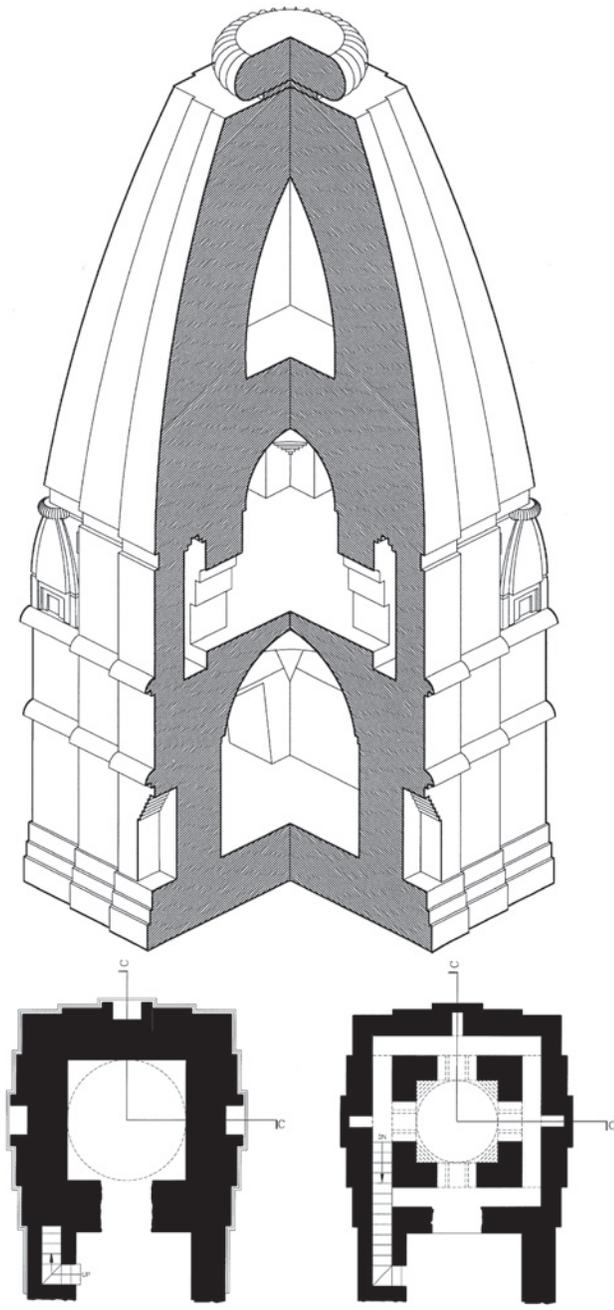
Nandana, Punjab, Temple A, axonometric section, elevation, and ground- and first-storey ground plans.
